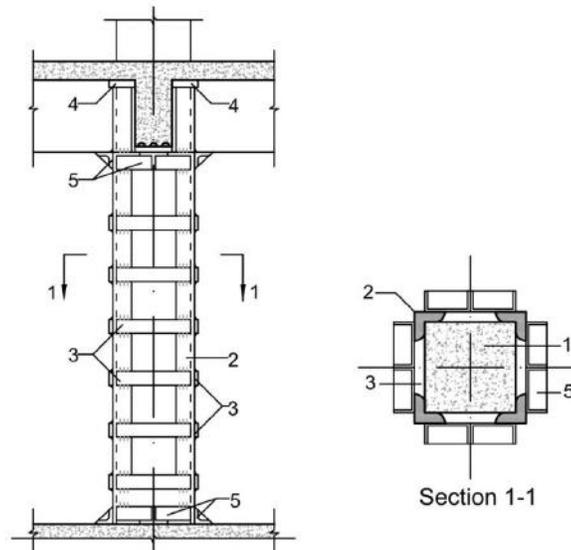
Steel jacketing of a RC column (1- existing column; 2- steel angle section; 3- steel strap; 4 – supporting plate; 5- top/bottom stiffeners) (UNIDO, 1983).
